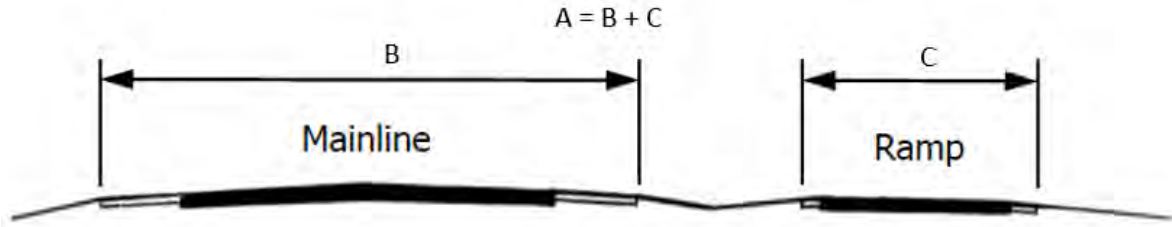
Approach roadway cross-section view for a mainline and a ramp that are carried across one structure
